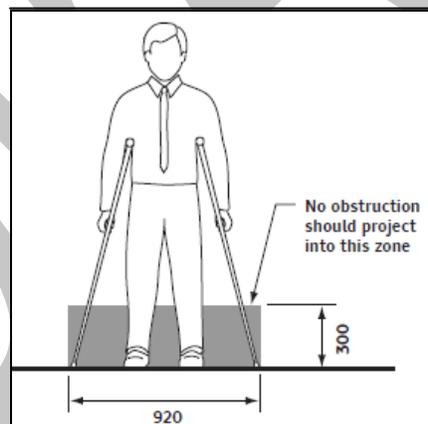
Walkway width (in mm) for persons using crutches (CAN/CSA-B651)
